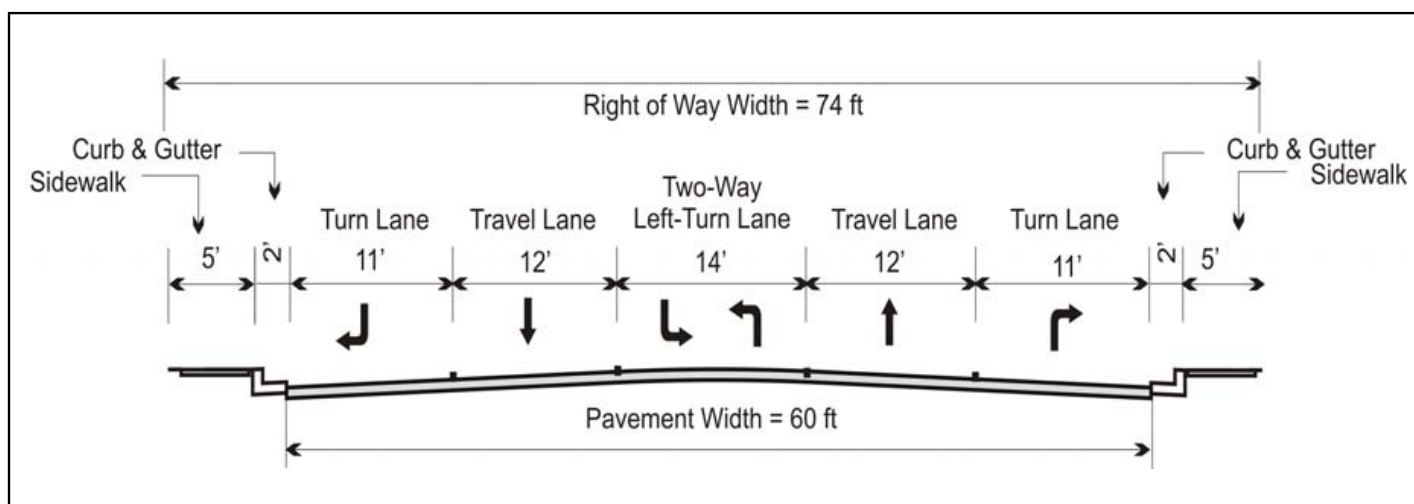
Three-lane Major Collector Street Cross-section, At Intersections
